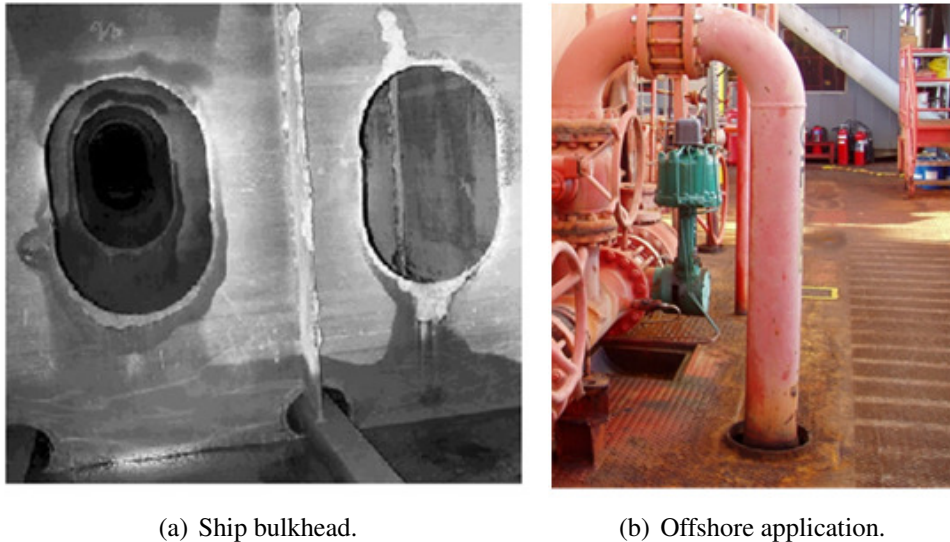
Typical applications where plates with openings are used in (a) bulkheads^[1] and (b) offshore structures.
